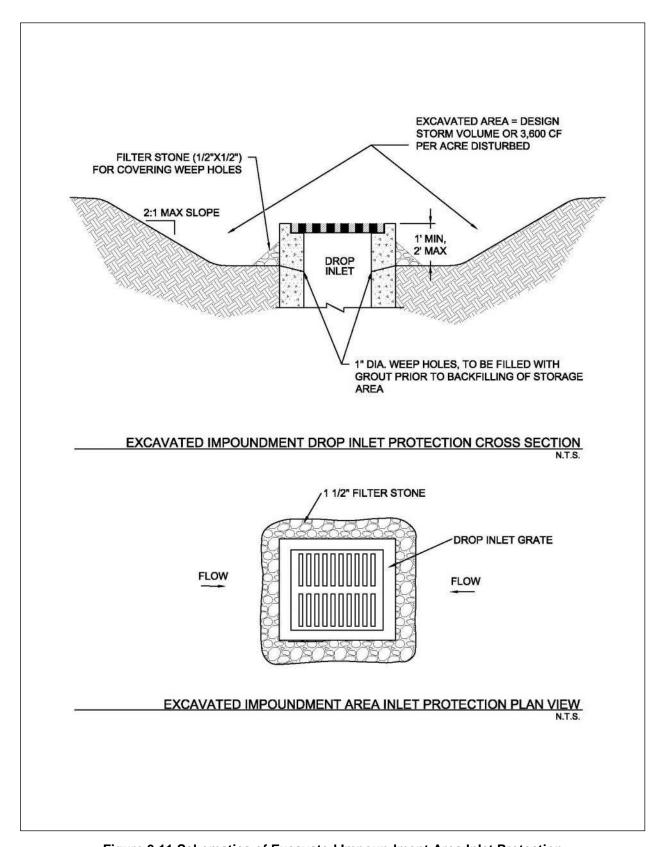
Schematics of Excavated Impoundment Area Inlet Protection
